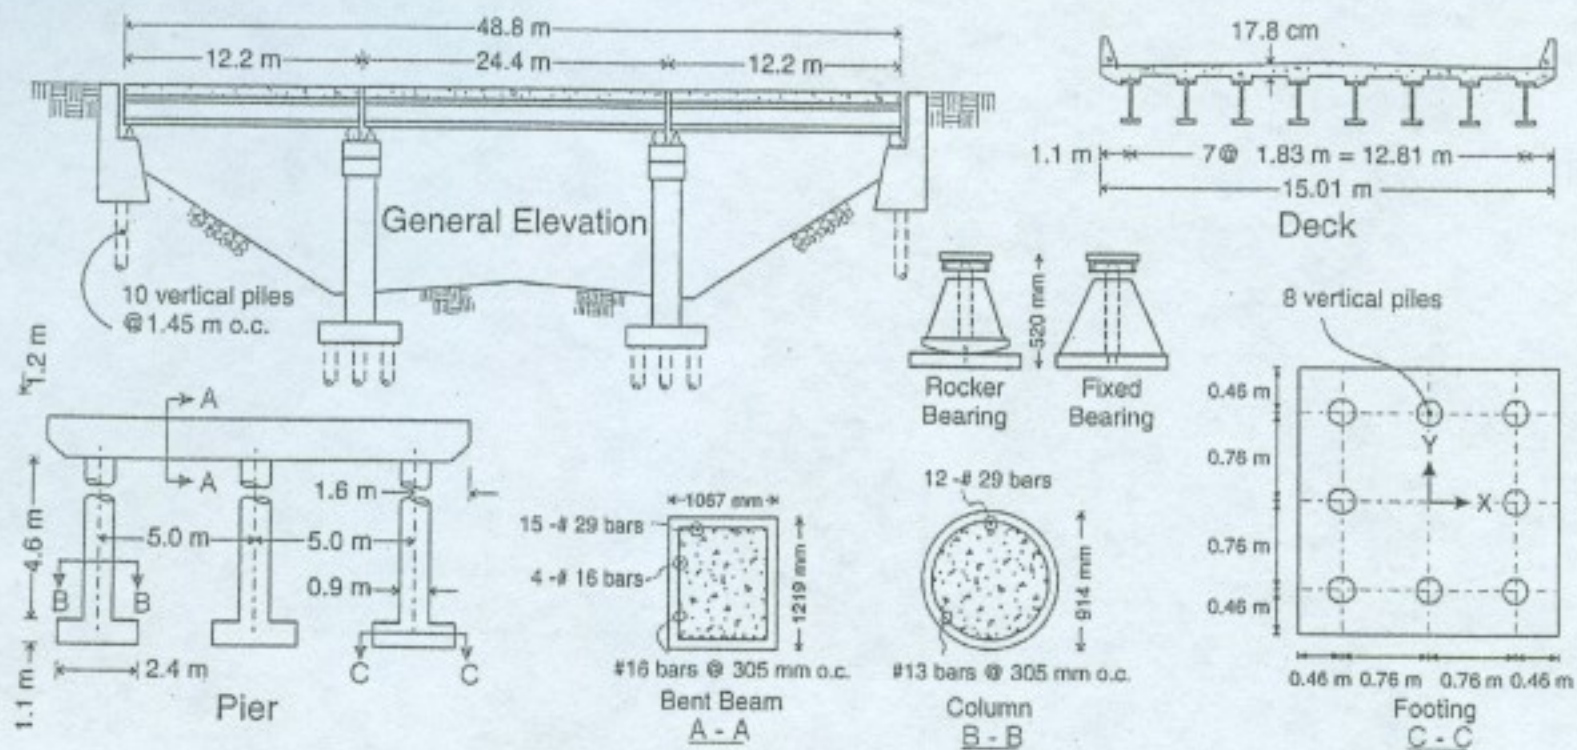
Configuration of typical MSSS steel girder bridge in CSUS.
